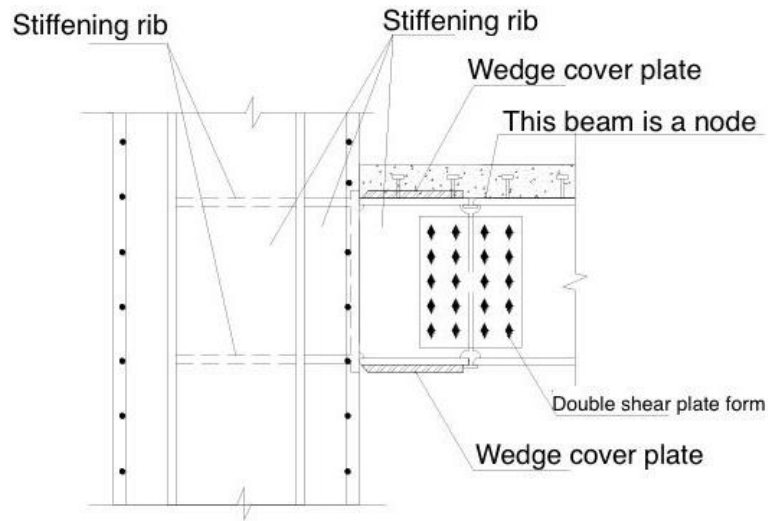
Schematic diagram of rigid joint between steel column and steel beam in core tube shear wall
